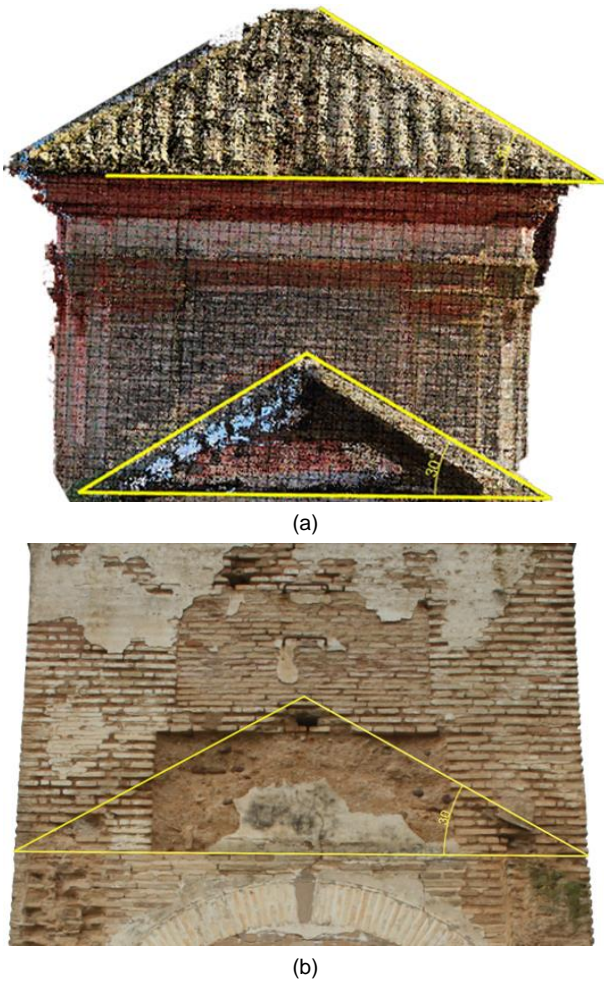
(a) Collar beam roof over the press and hipped roof at the Charcón mill; (b) impressions on the tower at the Notario mill. We verified the angle of inclination as 30° for the pitches of the roofs of both the press (collar beam) and the counterweight tower (hipped roof).
